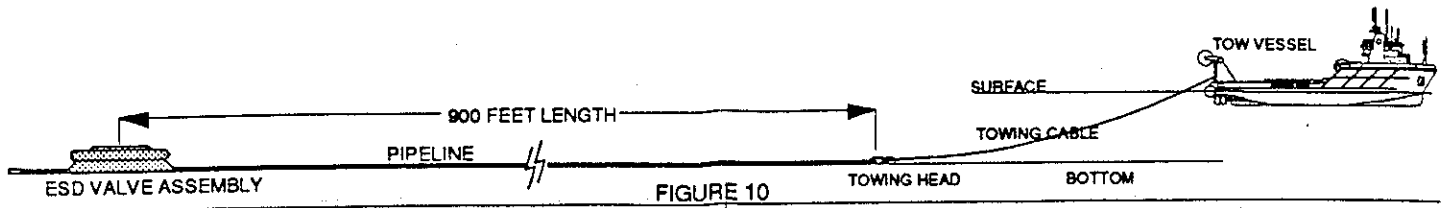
A profile view of the tow vessel, pipe, and valve assembly.
